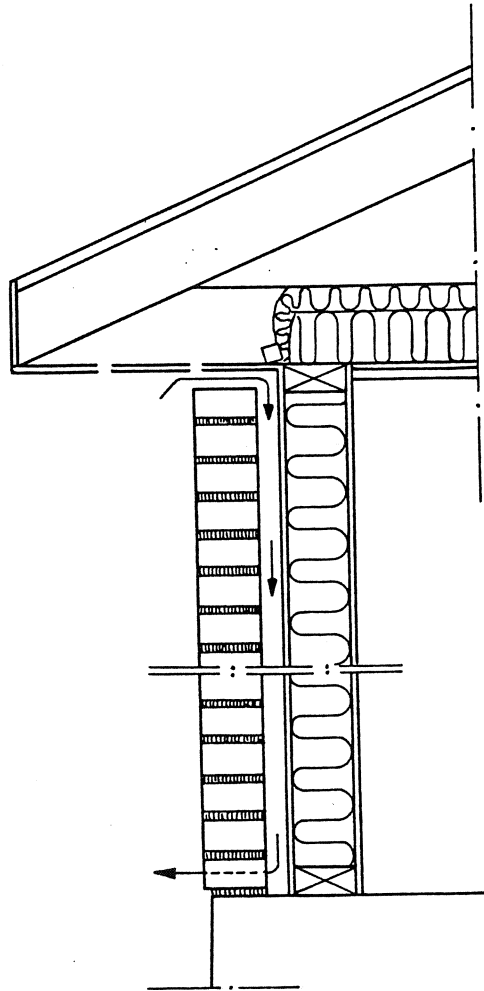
Air-flow in air-space along insulated crossbar structure with outer brick wall.
